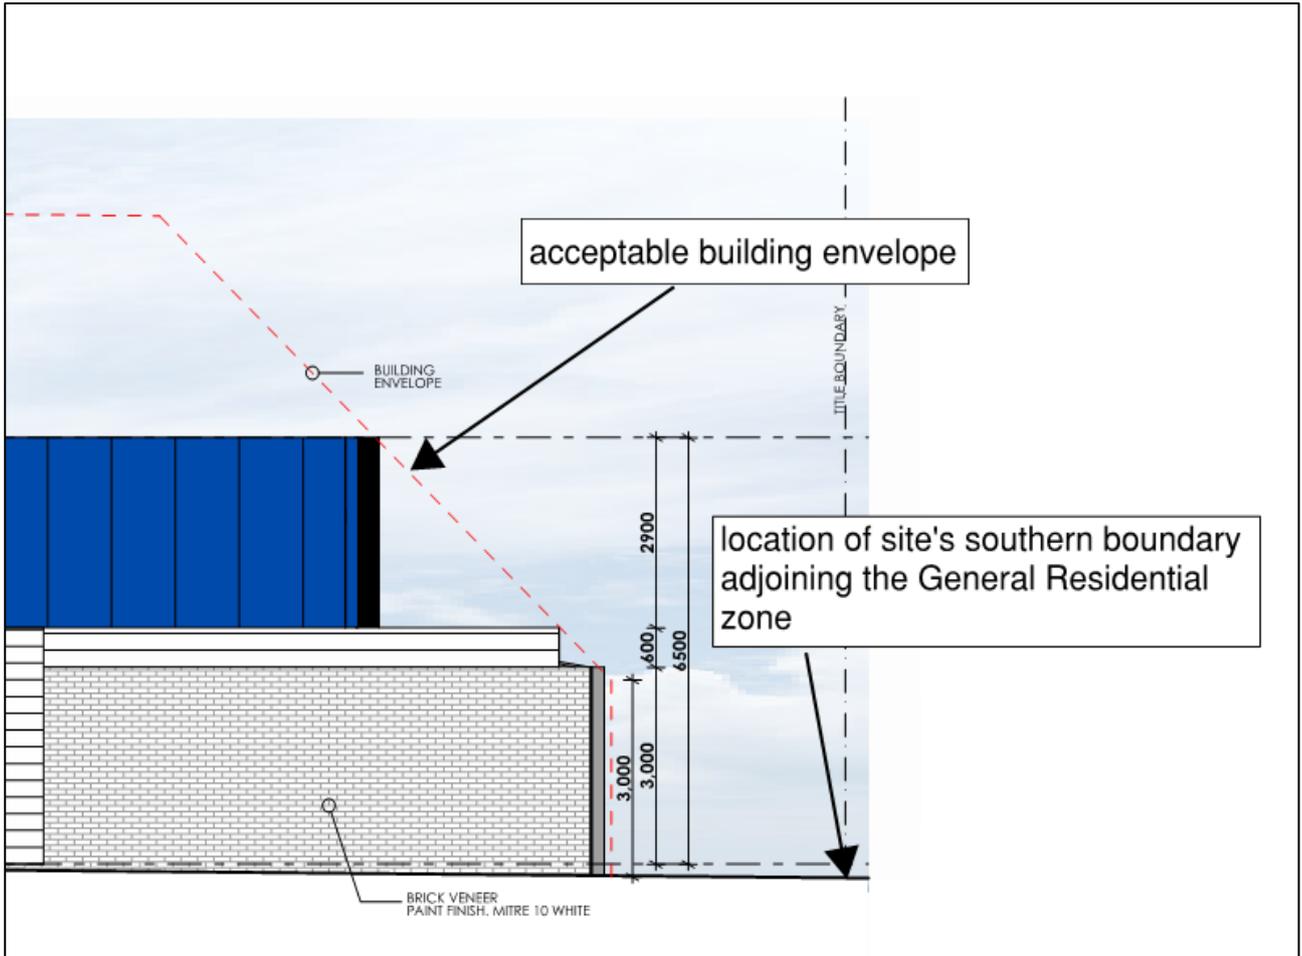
Section of the west elevation of the trade store building showing compliance with the 23.4.3 A1 (c) (Starbox Architecture, 2019)
